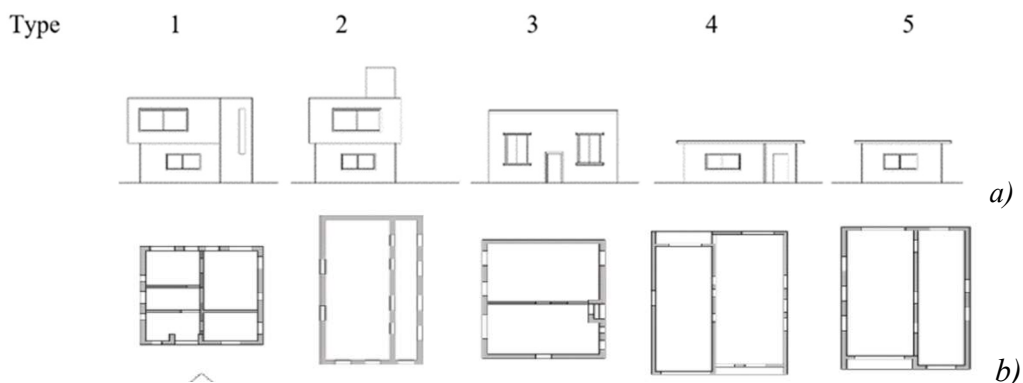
Typical houses constructed in region Mexico a) and b) wall system in plan view.
